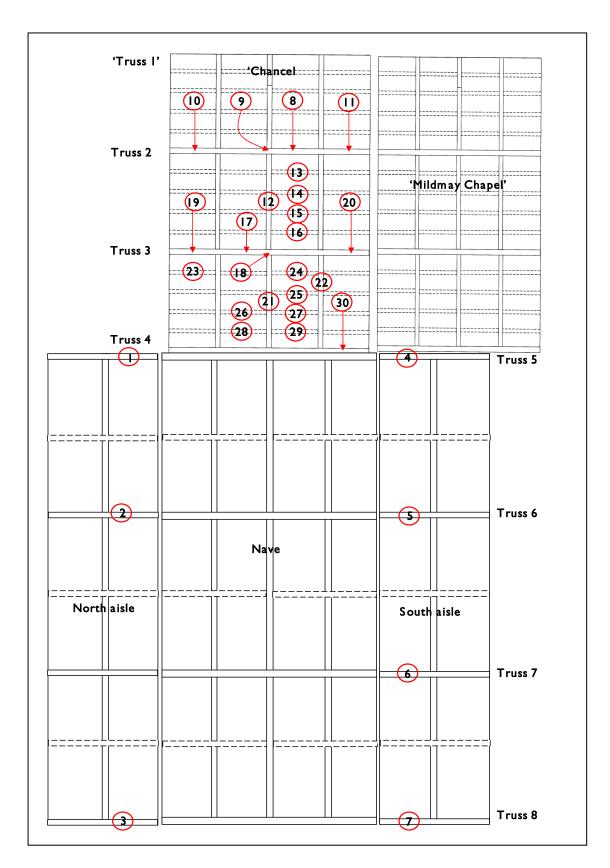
Plan of St Leonard's Church to show position of sampled timbers
